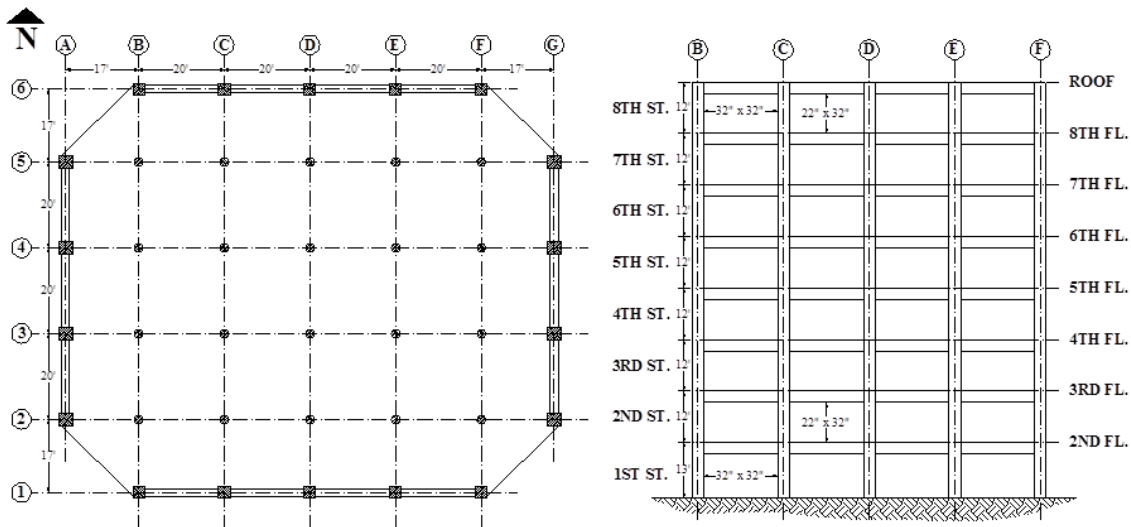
General layout of structural elements: (a) plan; (b) elevation of Frame 1.
